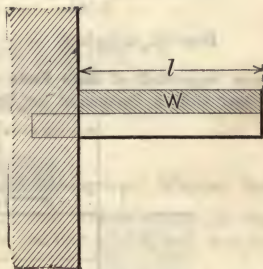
Cantilever Beam. Distributed Load over Entire Span
